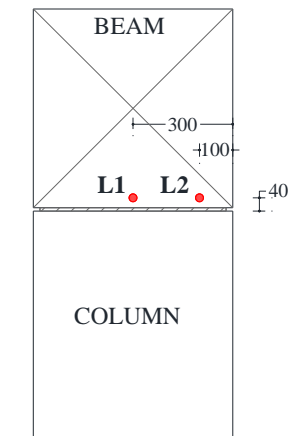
Geometrical layout of the LVDTs at the beam end (dimensions are expressed in mm)
